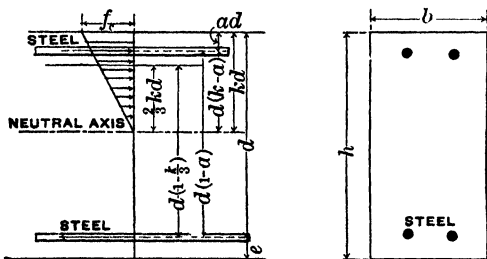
Resisting Forces with Steel in Top and Bottom of Beam. (See p. 358.)
